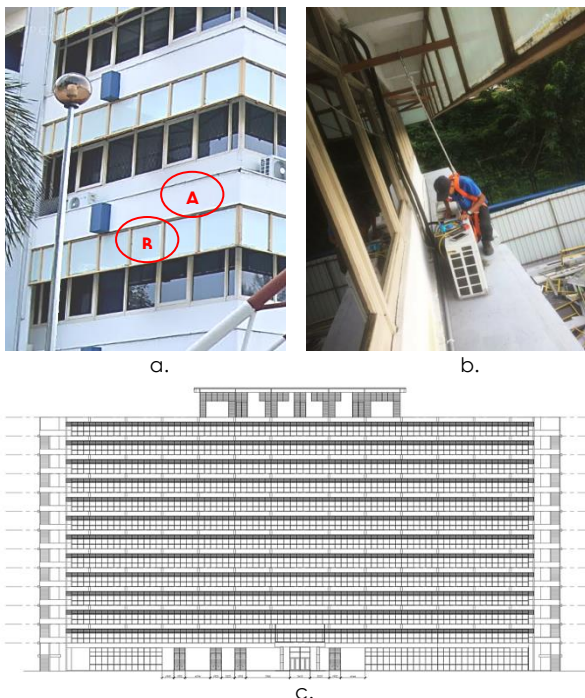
Case building of Wisma Persekutuan Seremban: (a) Existing shading devices, A – concrete ledge, B – polycarbonate horizontal shading, (b) Concrete ledge shading; and (c) Front elevation drawing
